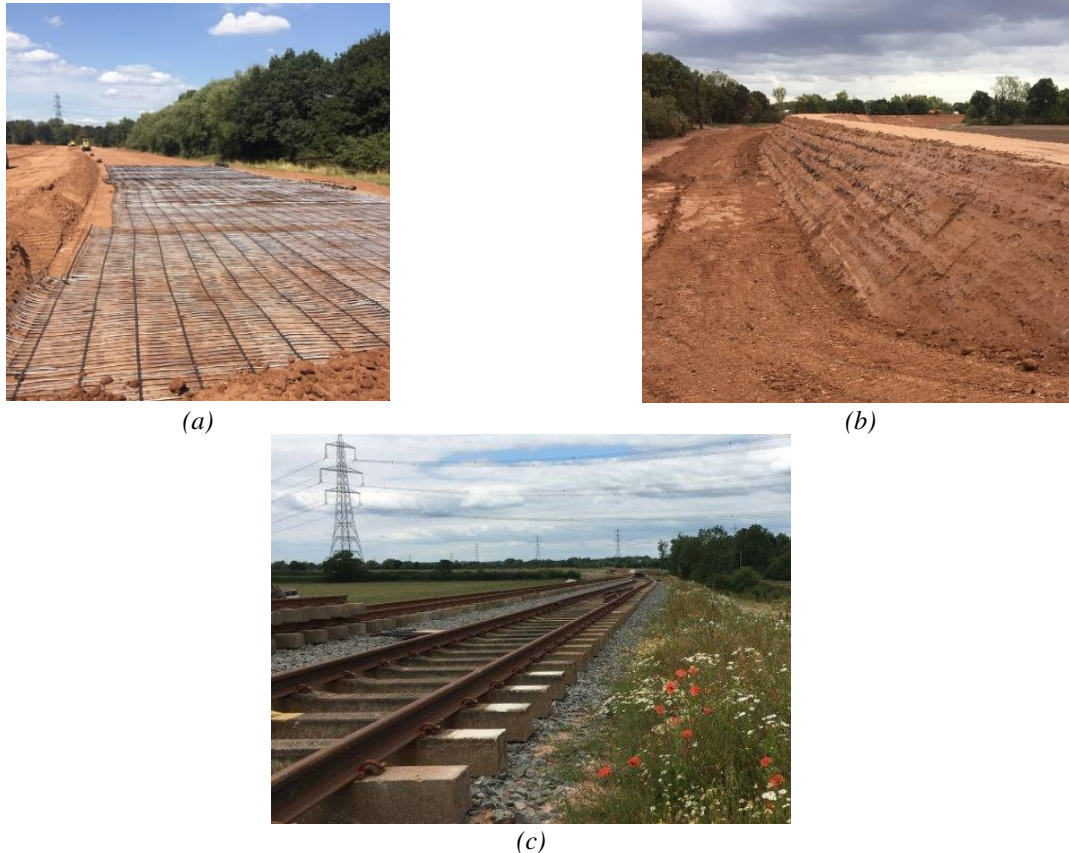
(a) Installation of the draining geogrid, (b) finished embankment before laying of track, and (c) completed embankment with track installed.
